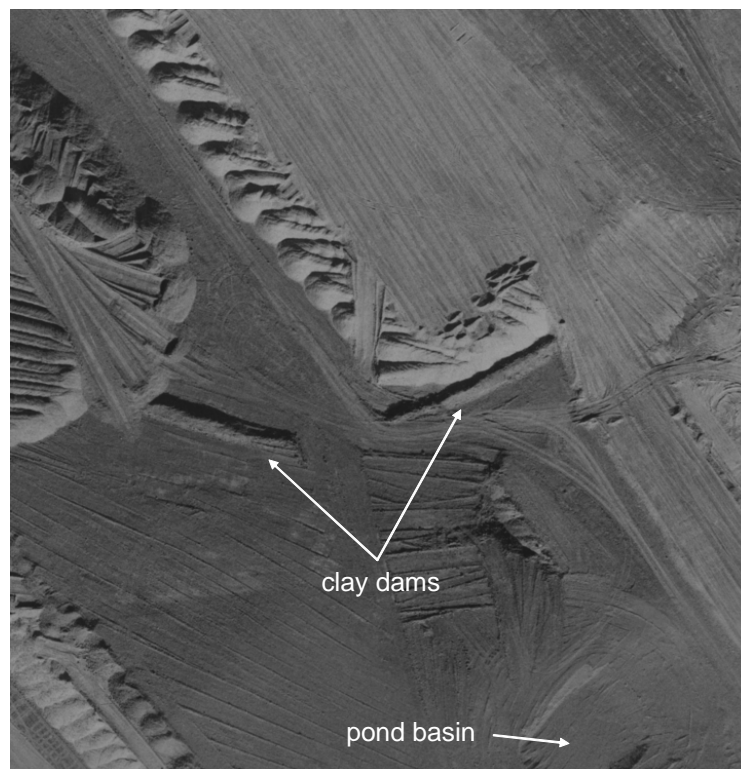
Subsurface clay dams in the footslope area: Detail of the aerial photograph, October 2004 (© Vattenfall Europe Mining AG).
